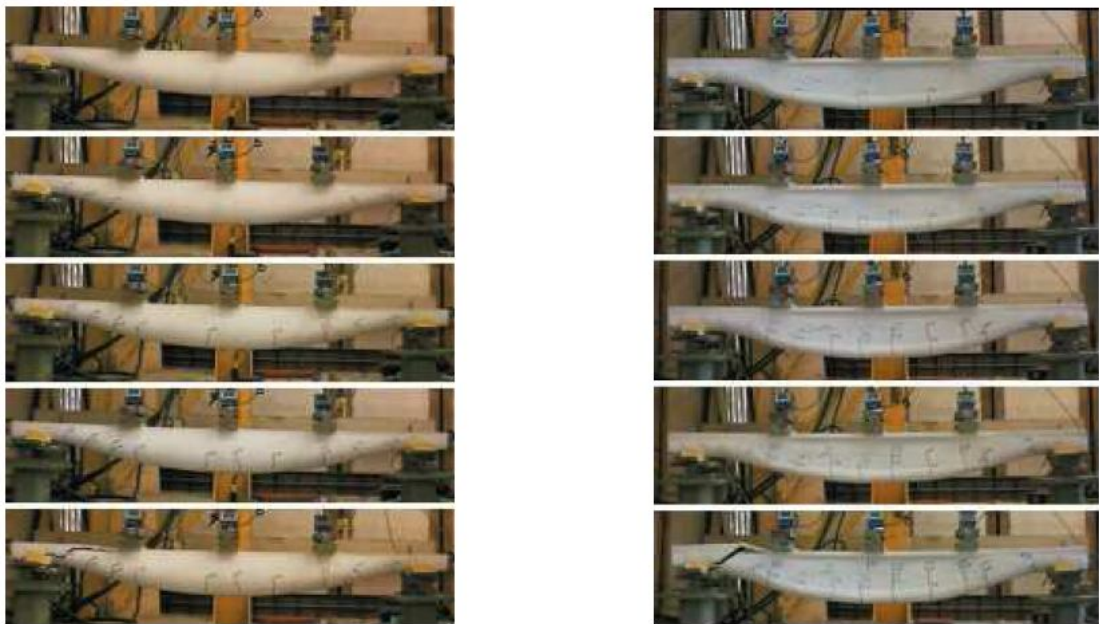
Loading Sequence: Beam 1 (Left) and Beam 2 (Right)
